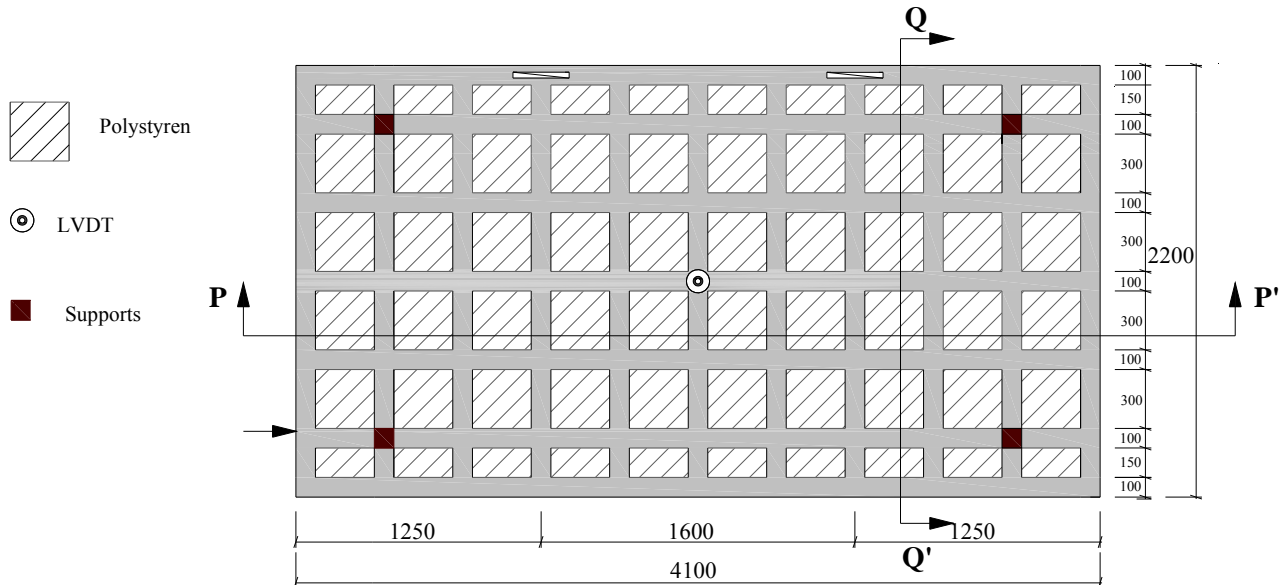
Setup of the loading test (dimensions in mm)
